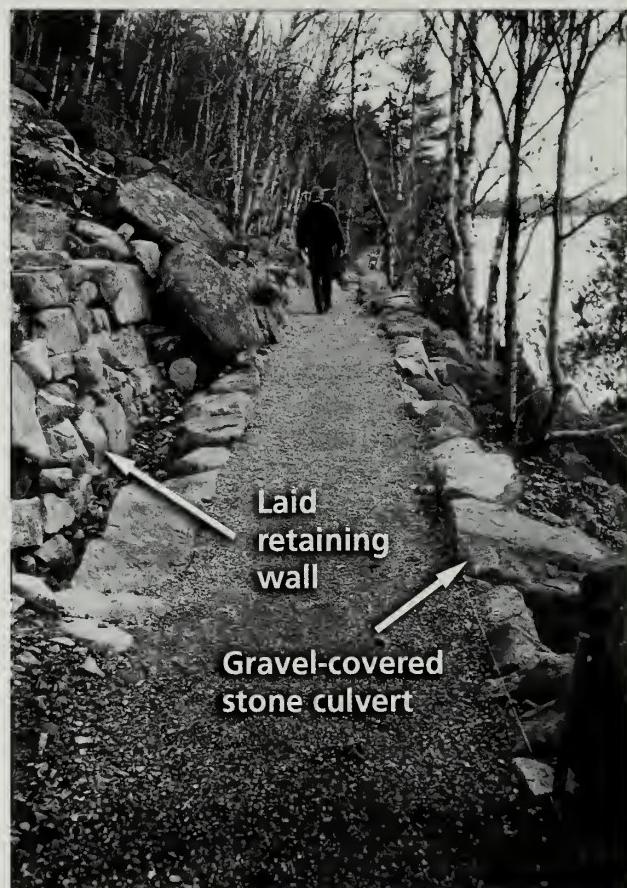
Stone retaining wall constructed in 2001 on the Jordan Pond Path (#39) to retain the uphill side of the trail which receives heavy water flow. The wall was built in conjunction with a gravel-covered stone culvert, side drain, and walled causeway.
